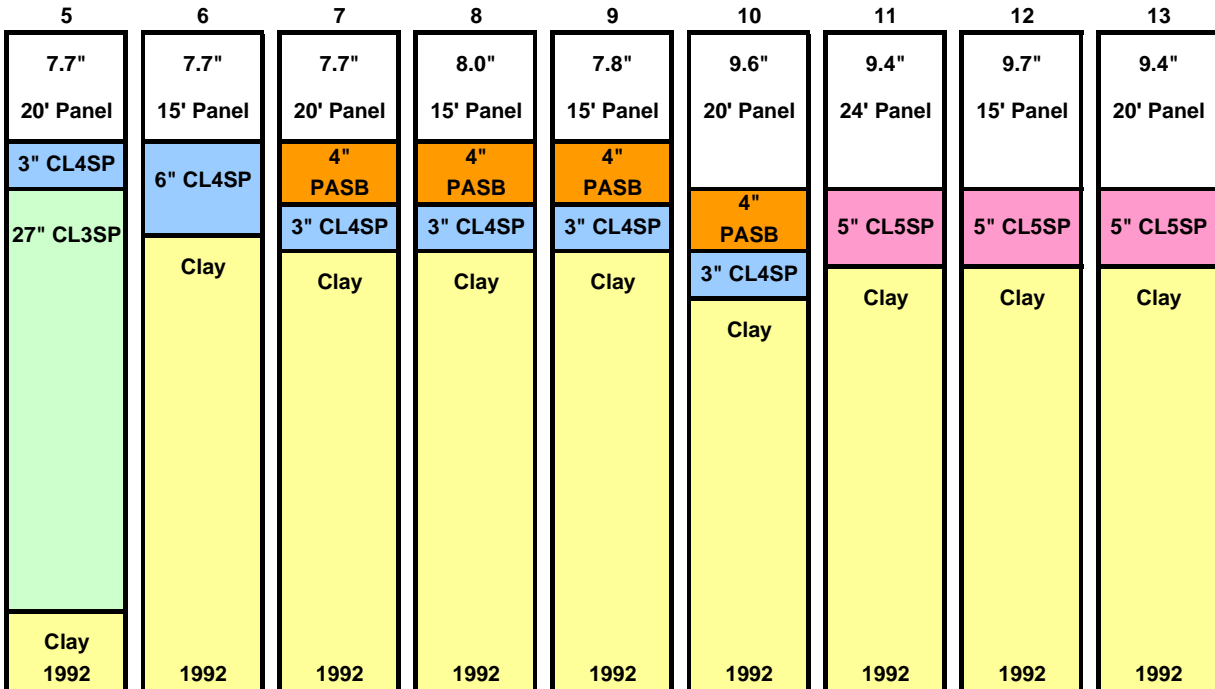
MnROAD Phase 1 interstate test cell design details.
